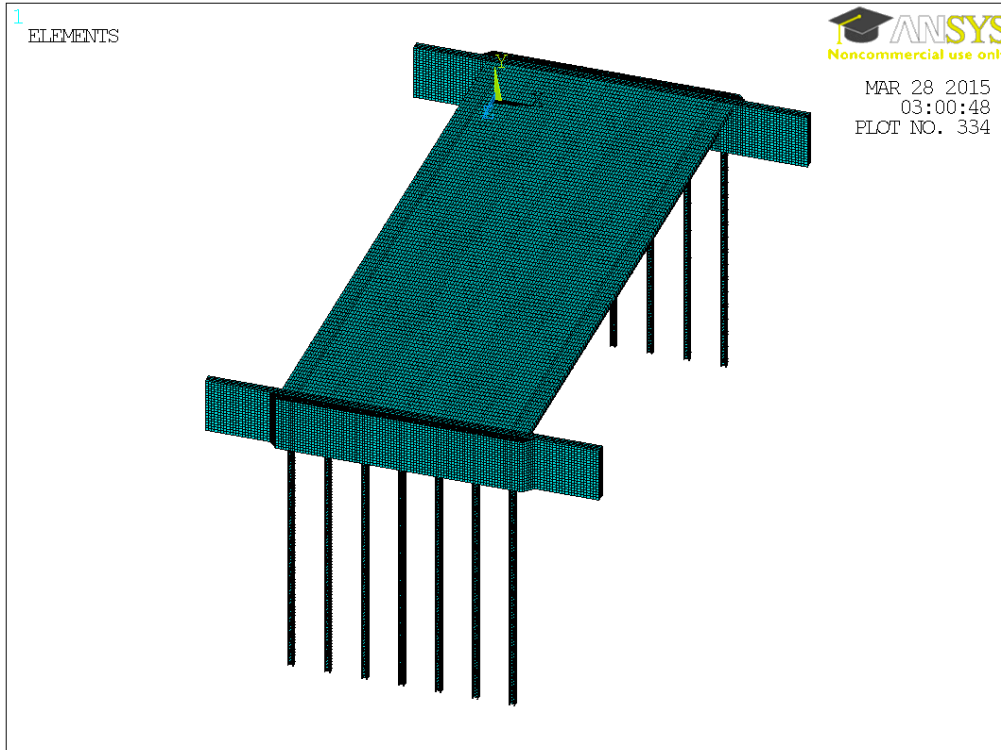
Finite element model of an integral abutment bridge with inline cantilever wingwalls
